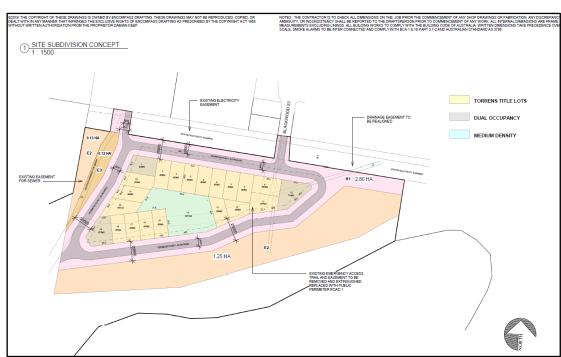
Subdivision and Zone Concept Plan by Love Project Management
